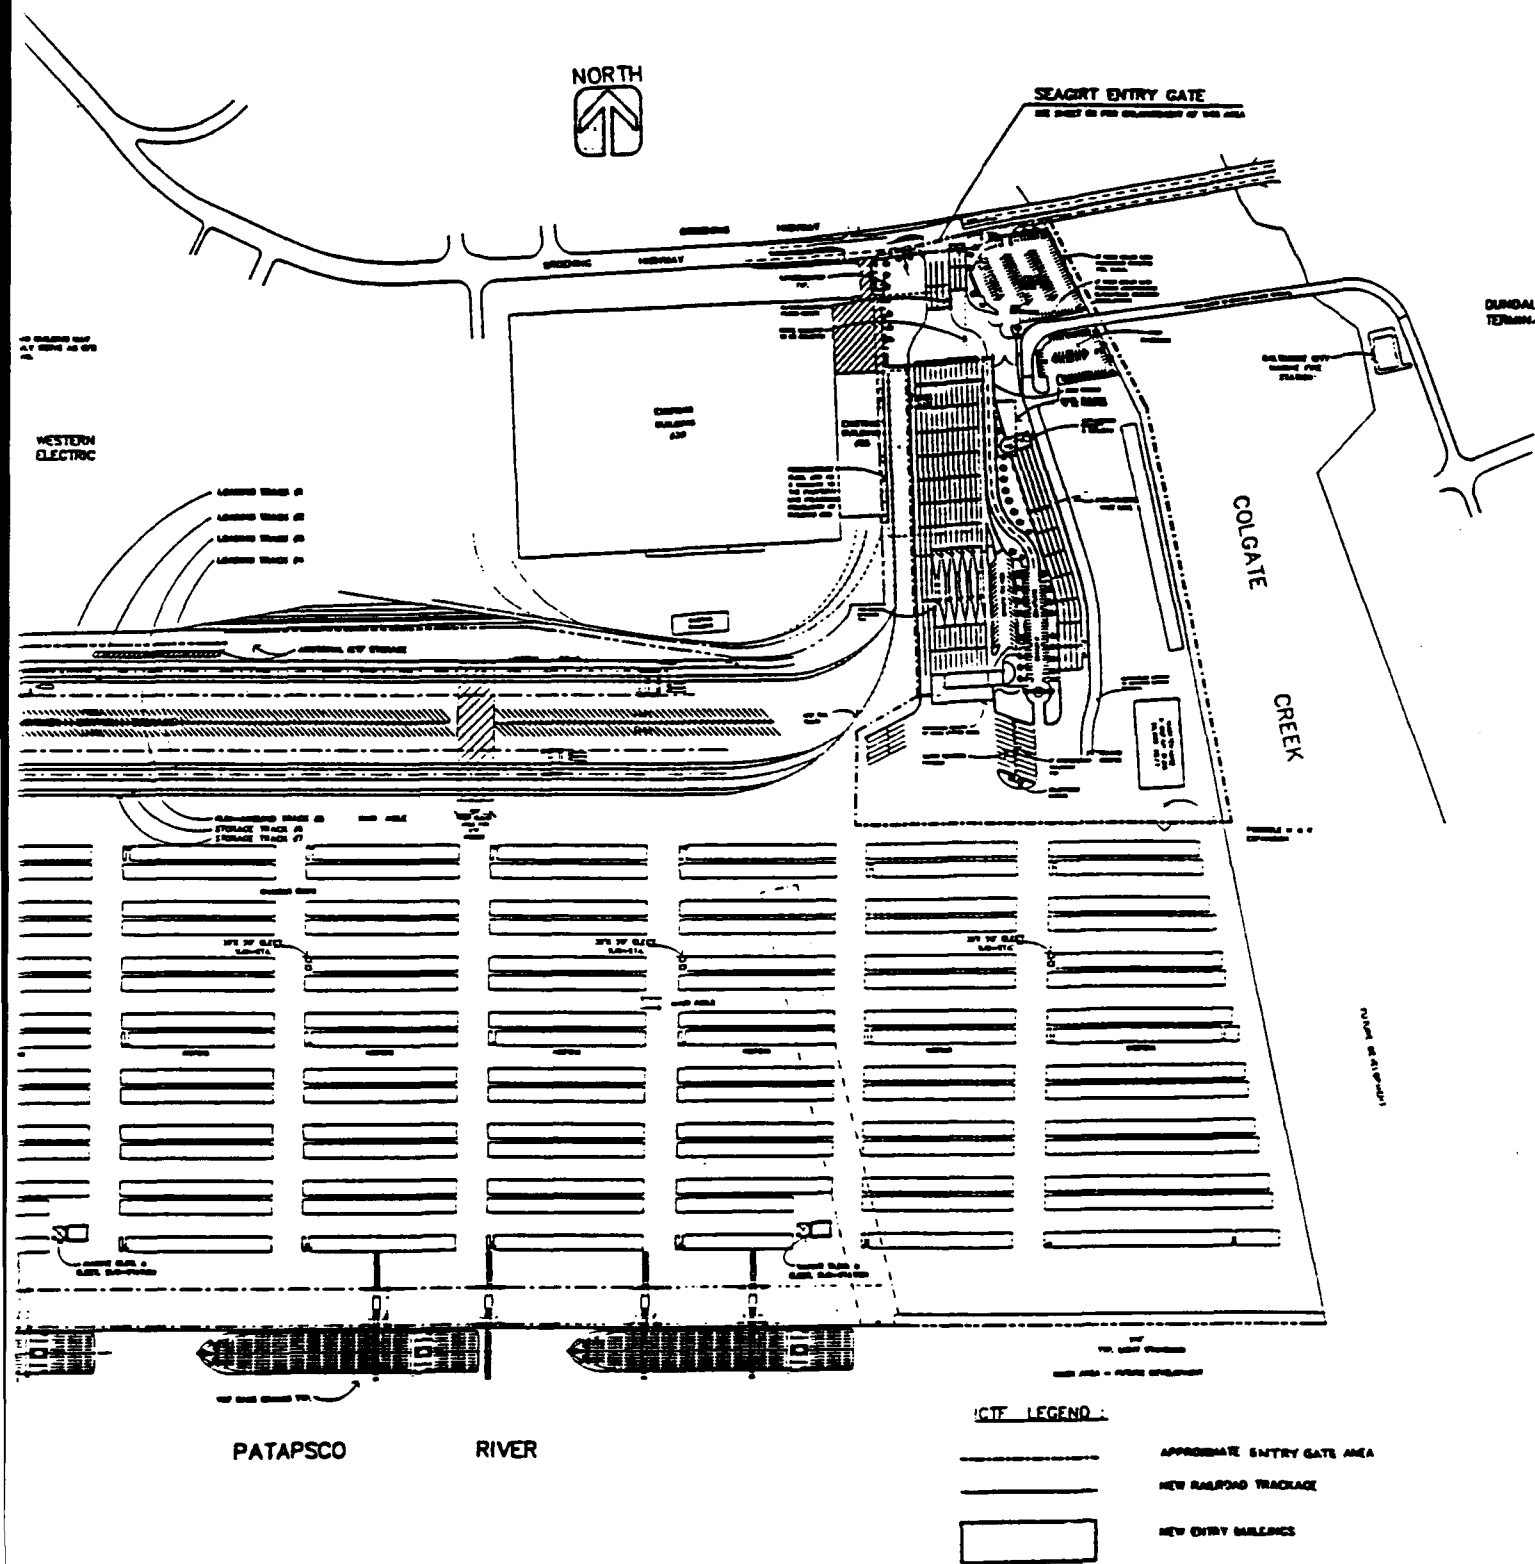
Seagirt Marine Terminal site plan.
